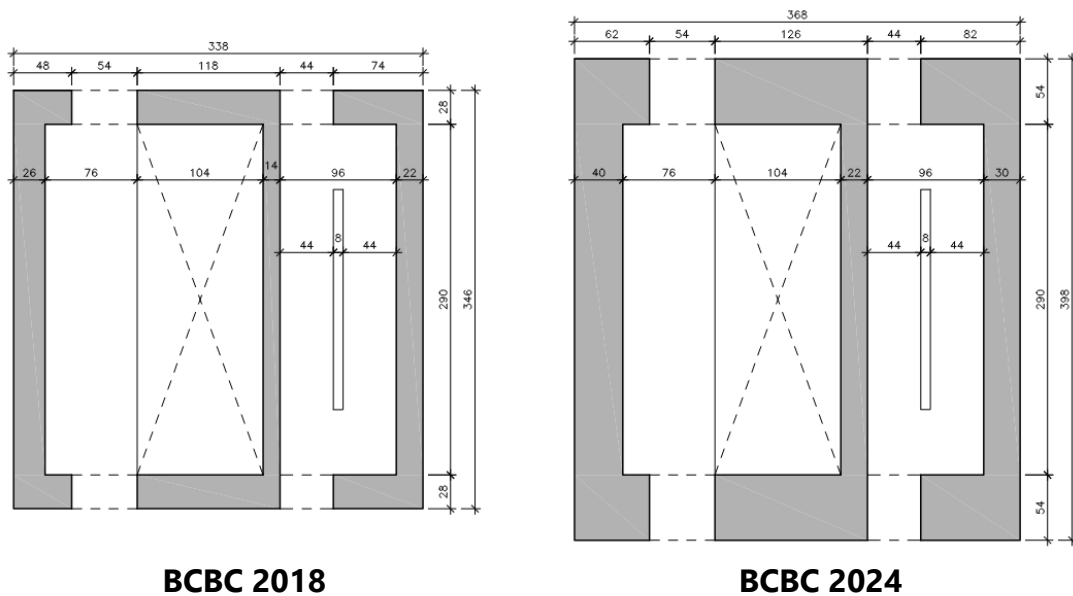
B – Mass Timber Tower Design Group 2 Comparison Plan
